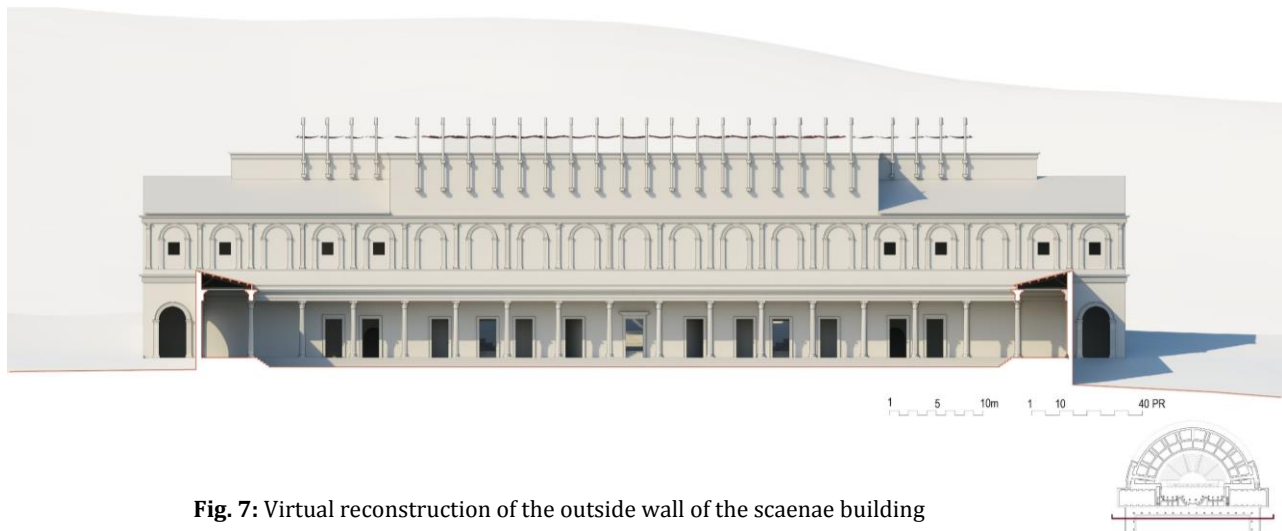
Virtual reconstruction of the outside wall of the scaenae building
